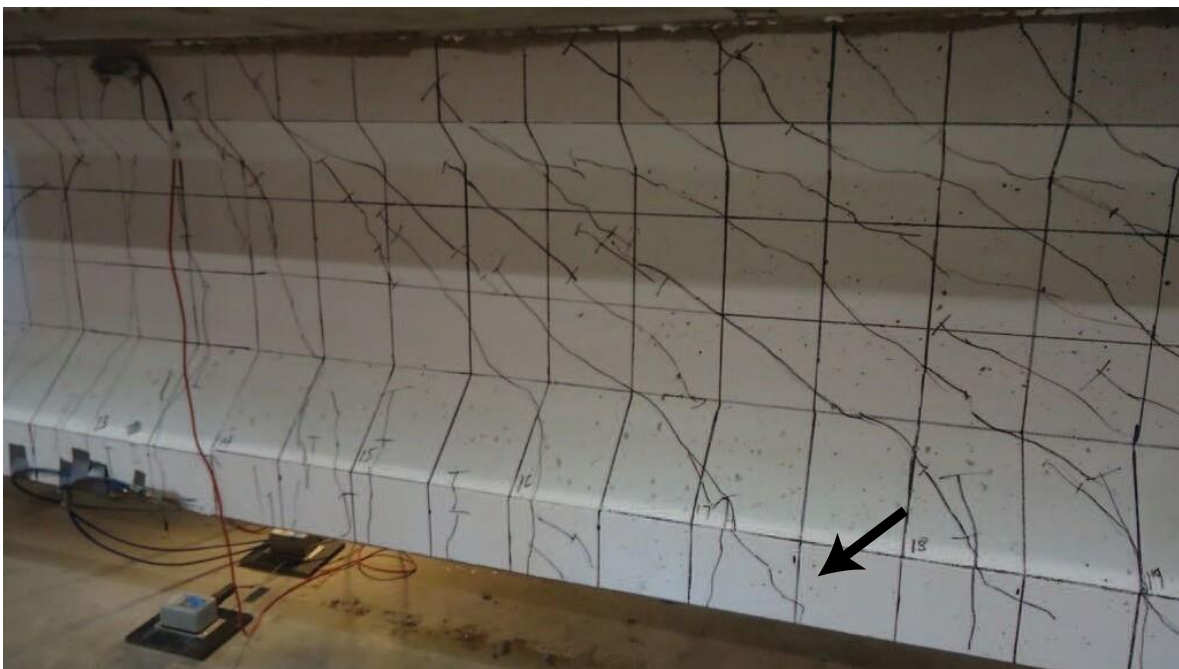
Shear cracking at 250 kips (arrow indicates cracks aligning with strands)
